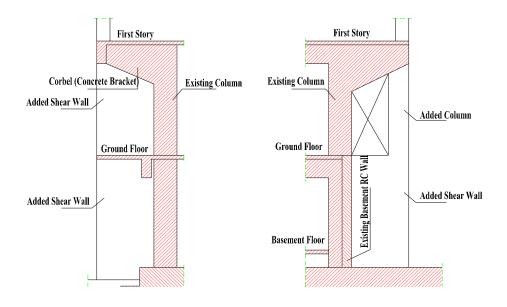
Strengthening examples for the second kind consoles: (a) adding shear wall, (b) adding column to the tip of the corbel
